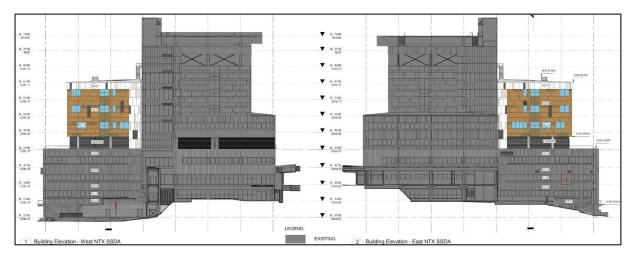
| SSD-8963 Approved east and west elevations (Base source: SSD-8963)
